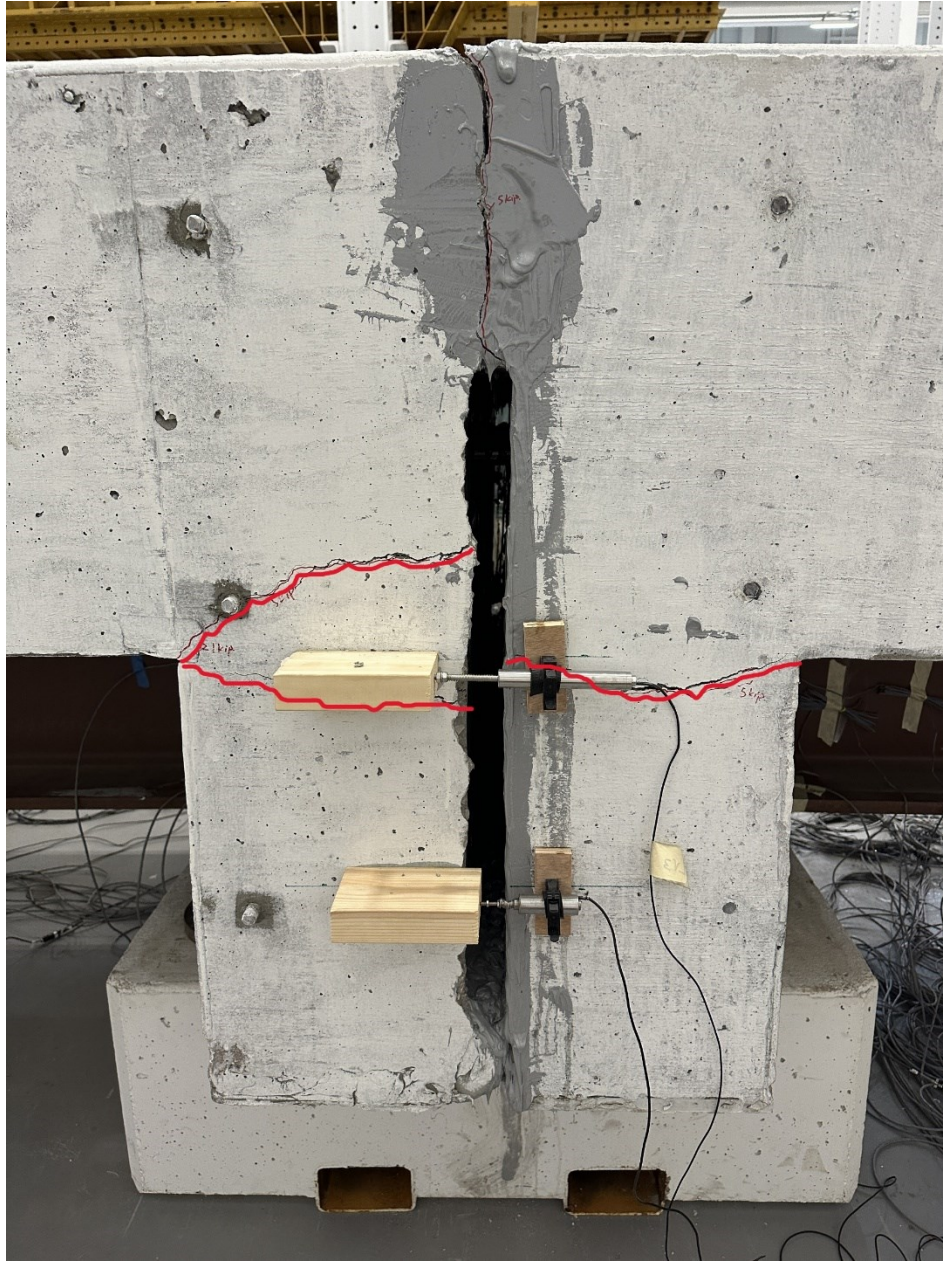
View of Cracking on the North Side of Deck in Match-Cast Joint.
